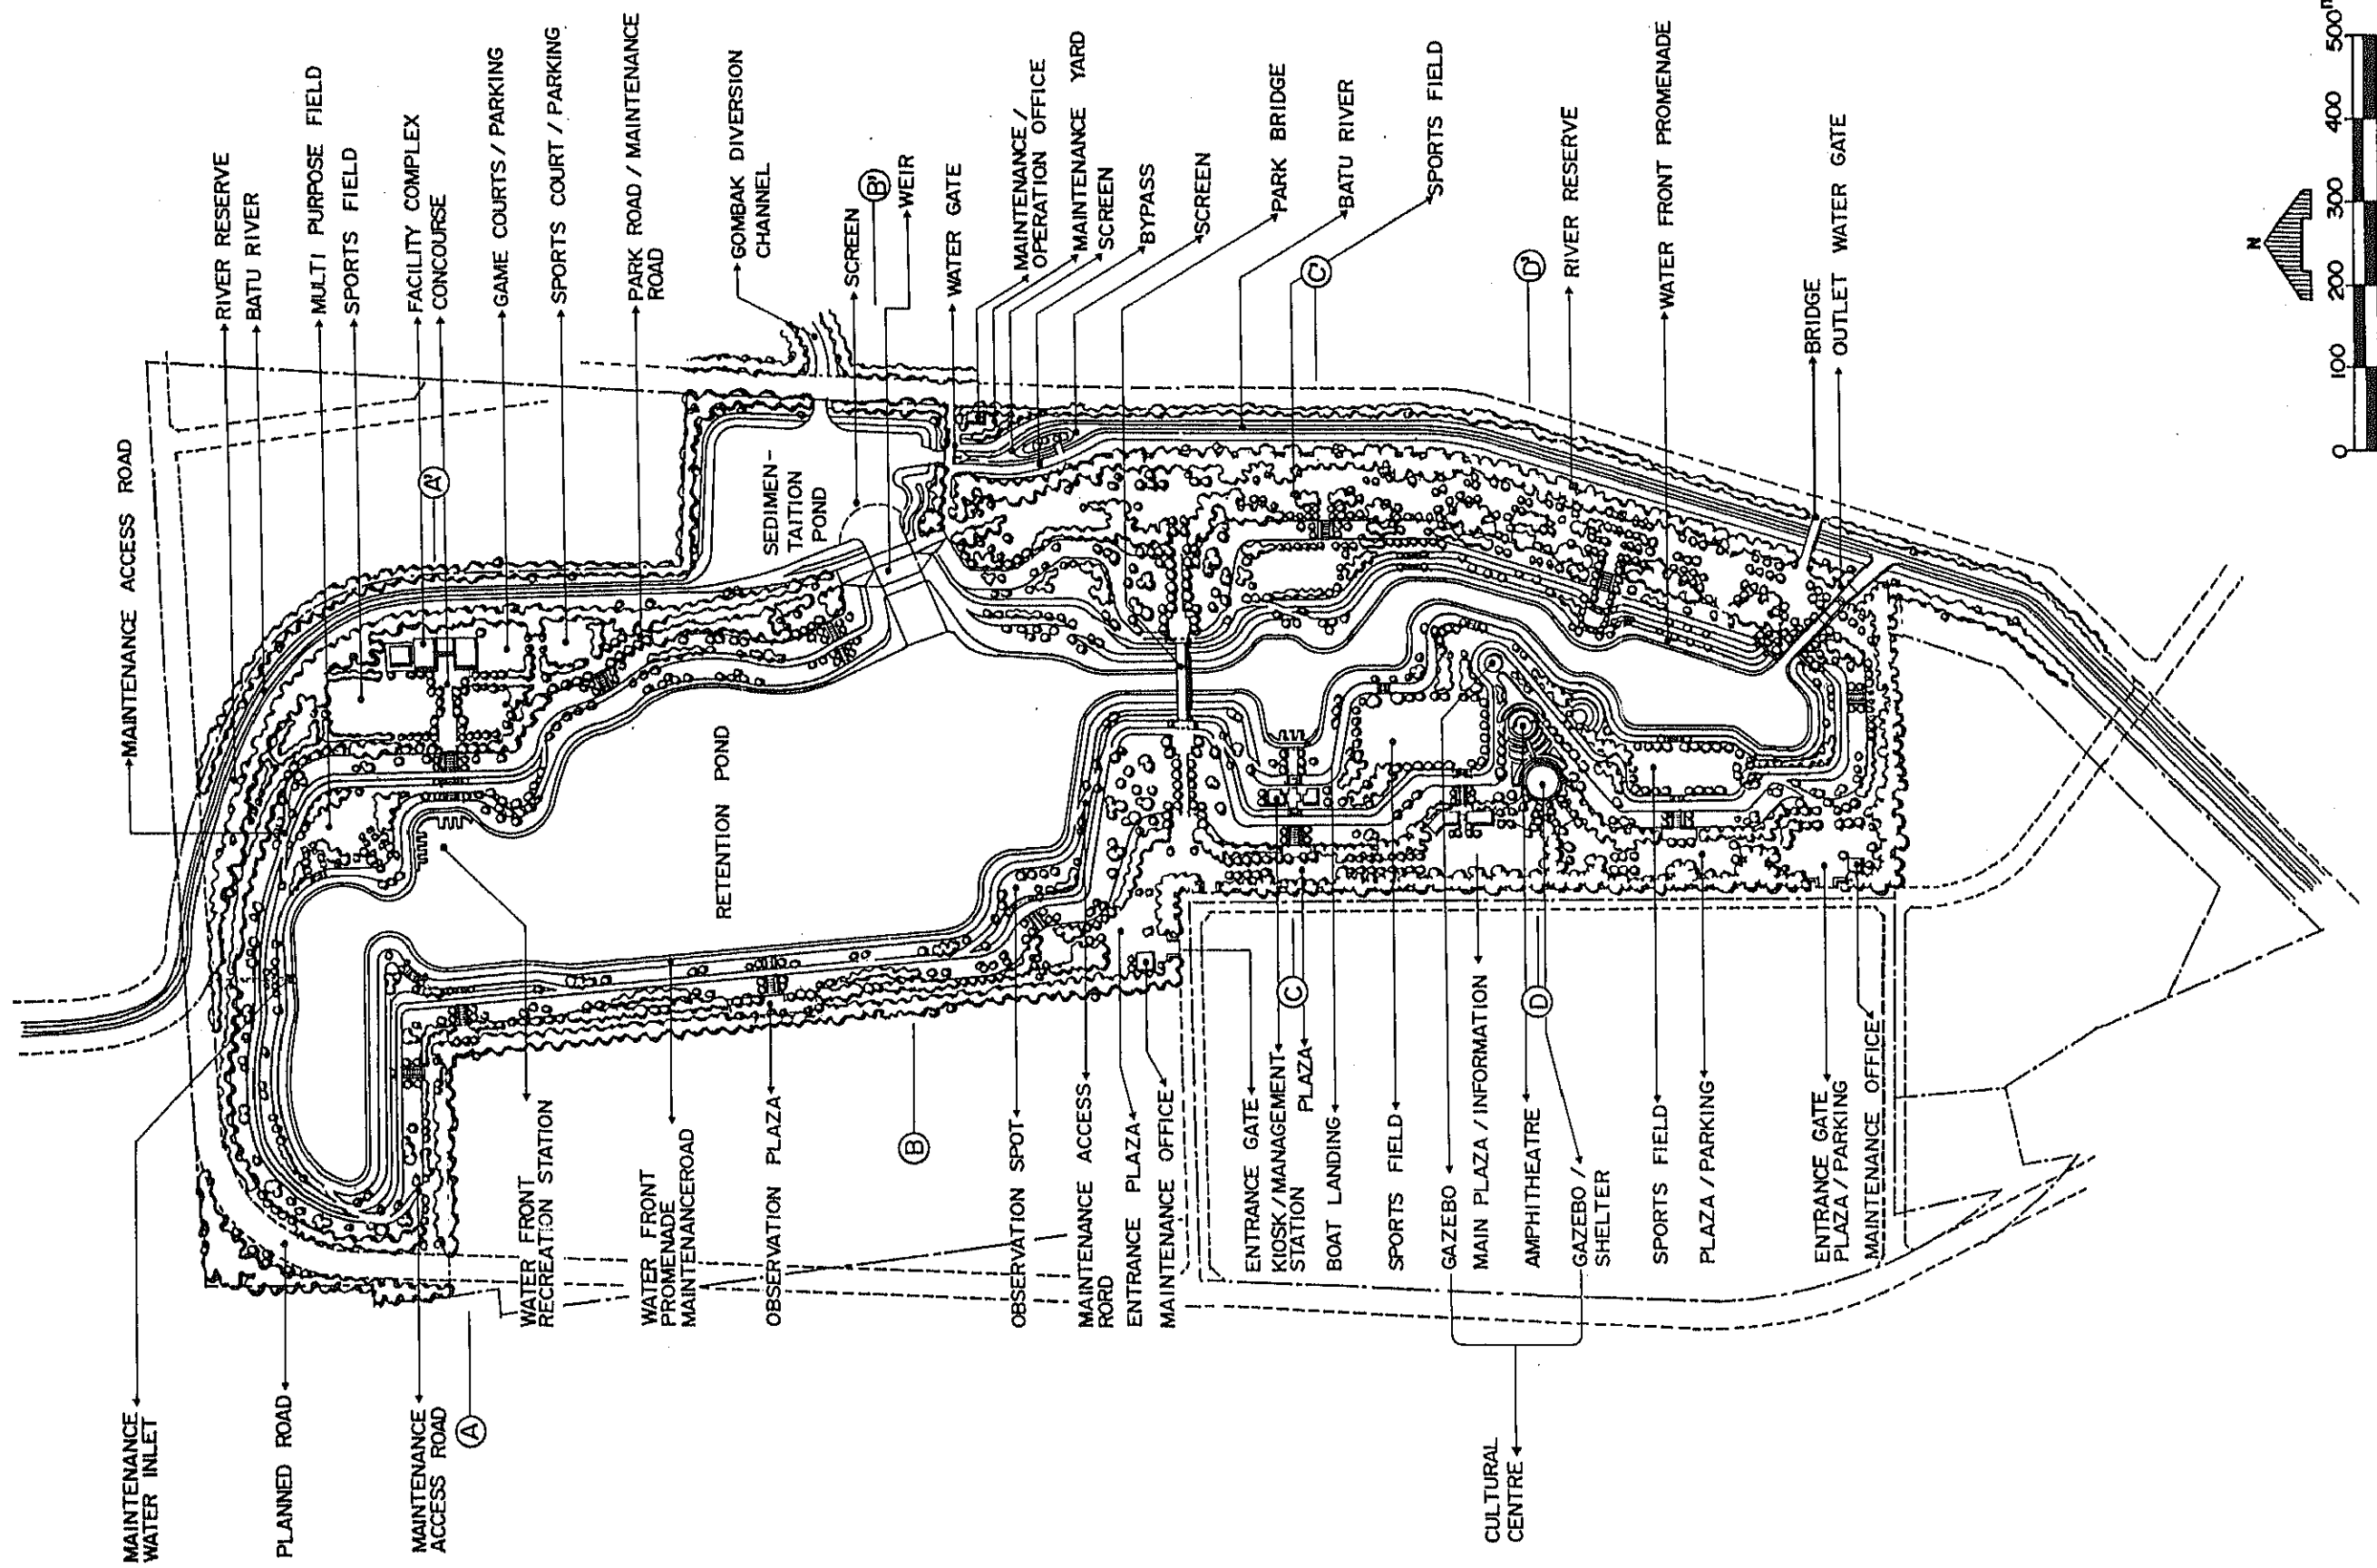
LAYOUT PLAN OF BATU RETENTION POND
